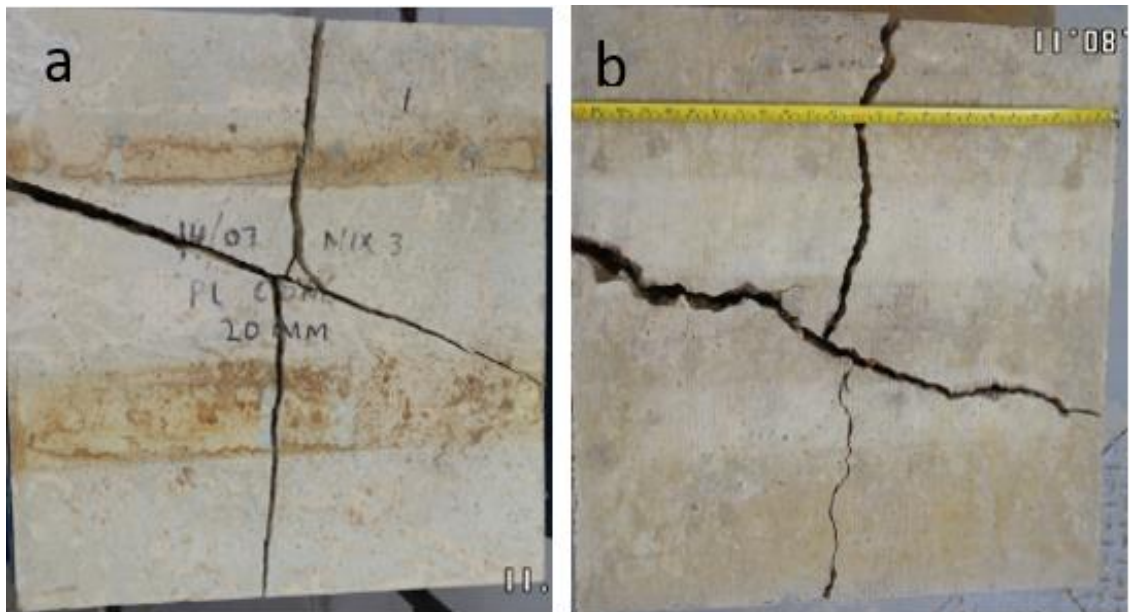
Cracks of plain concrete slab of 20 mm mix, (a) the slab surface where the load was applied and (b) the underside of the slab
